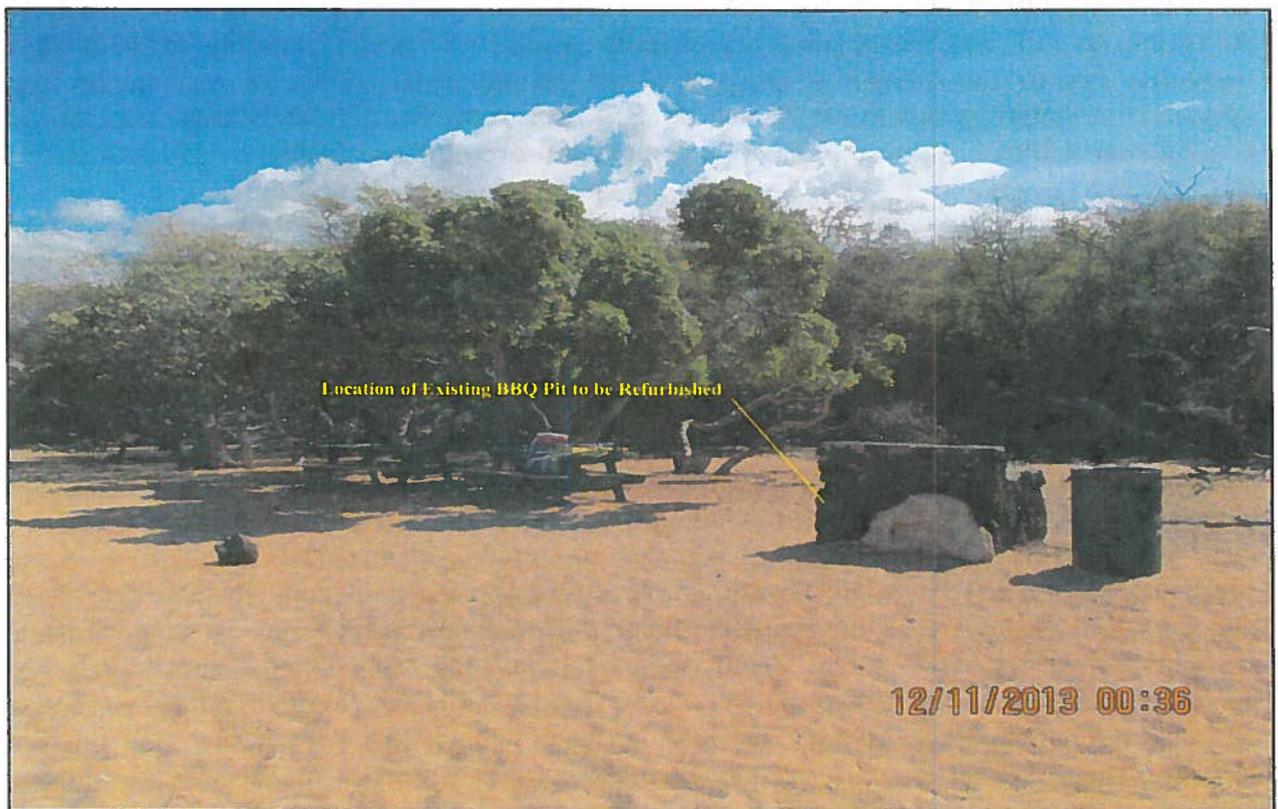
Location of the third existing BBQ pit on the beach to be refurbished. View is to the northeast (*mauka*).
